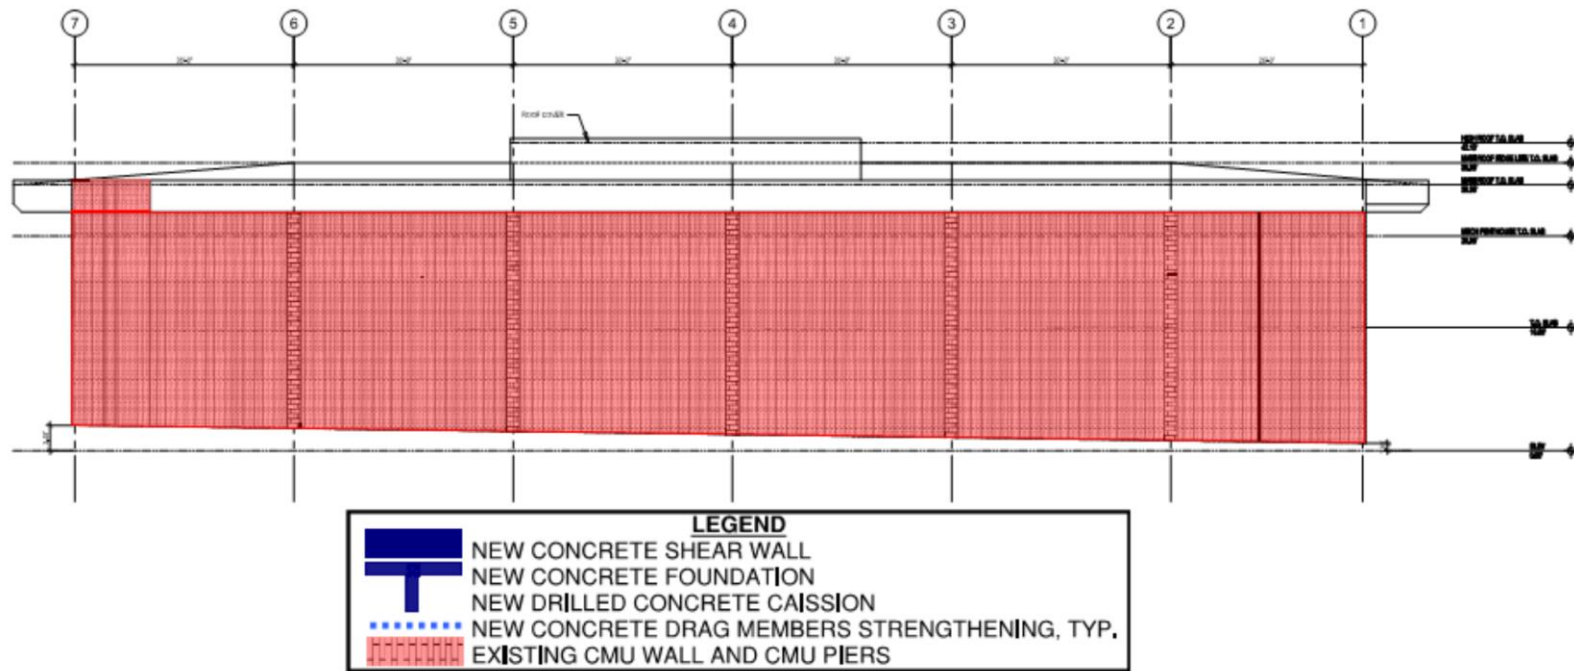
Option No. 1 – South Elevation – No Strengthening
